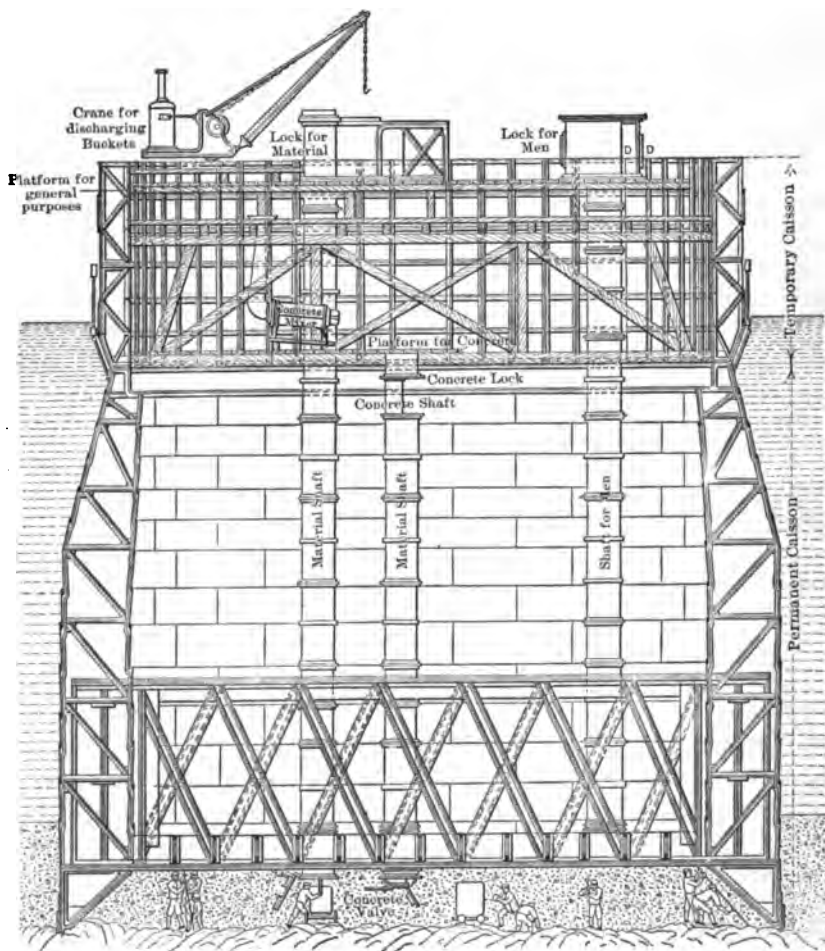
SECTION OF CAISSON WITH AIR-LOCK, FORTH BRIDGE.
